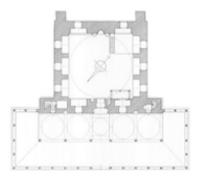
Kursunlu Mosque Ground Floor Plan (Ülgen, 1989)
